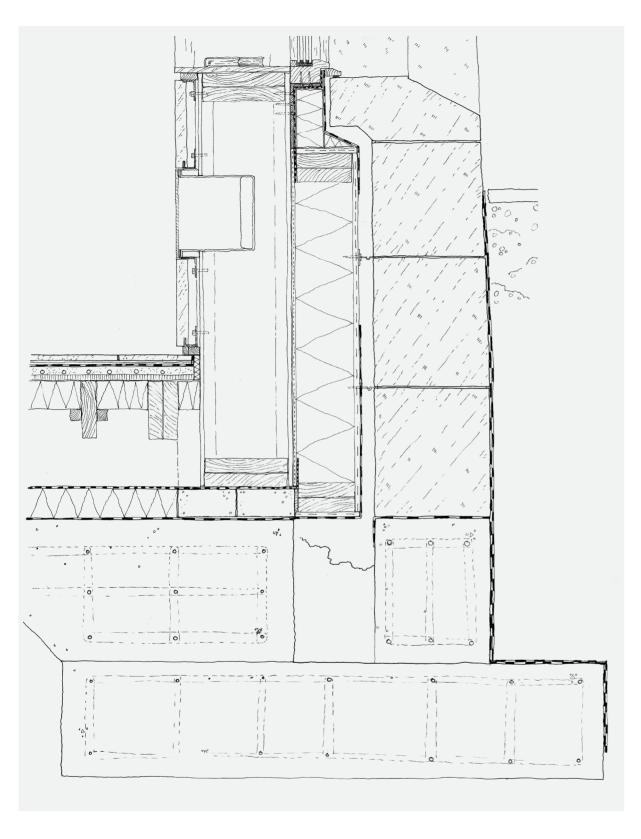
1:5 Detailing (Foundation and Window cill). NTS.
